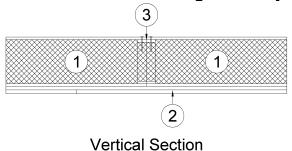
ASSEMBLY DRAWING FOR FIRE RESISTANCE
